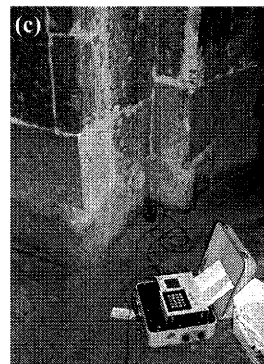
(a-d) Hripsime Church in detail. A ladder to balcony (a). Wall cracks repaired with white mortar (b). Equipments measuring ambient motions at the base floor (c). Skirting stone blocks as there is no foundation (d).
